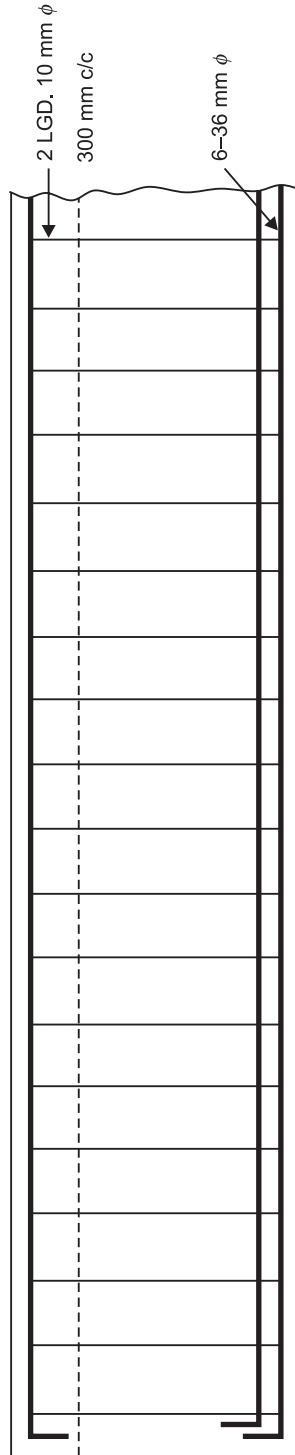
Longitudinal-section of the cross girder (Example 9.1).
